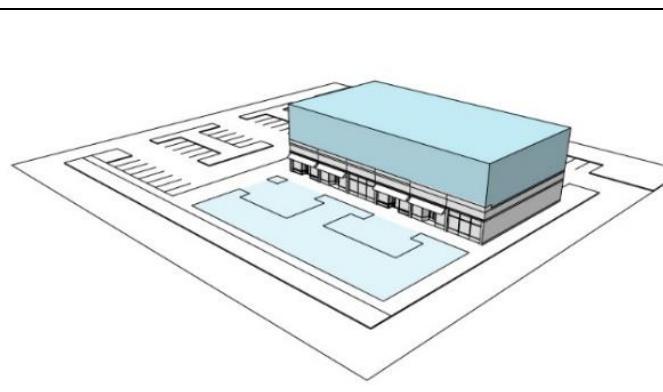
ADDITIONS TO EXISTING BUILDING IN THE MIX DISTRICT
